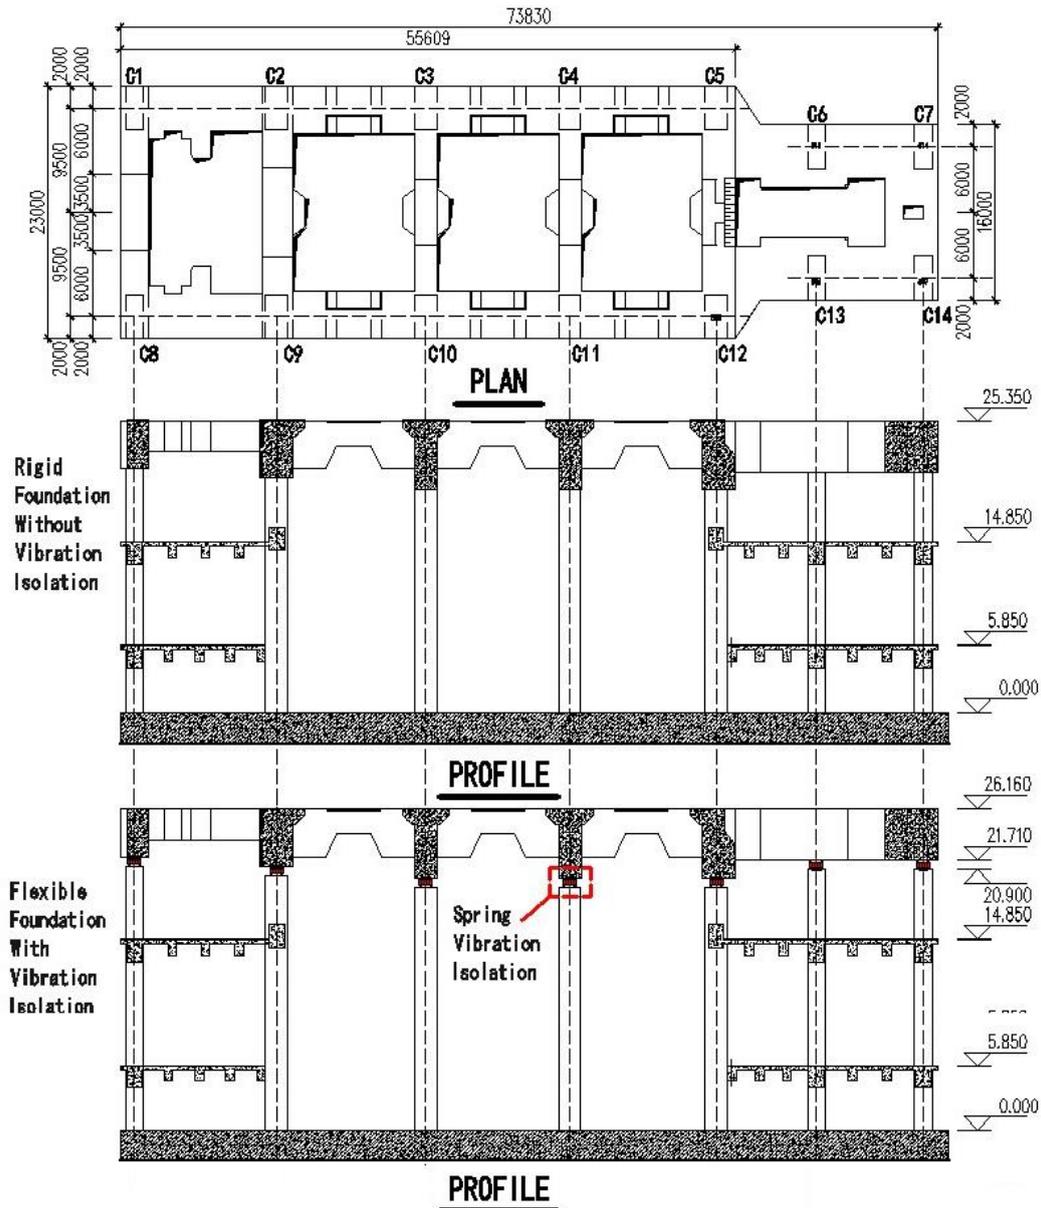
Plan and profile of the turbine-generator foundation (mm)
